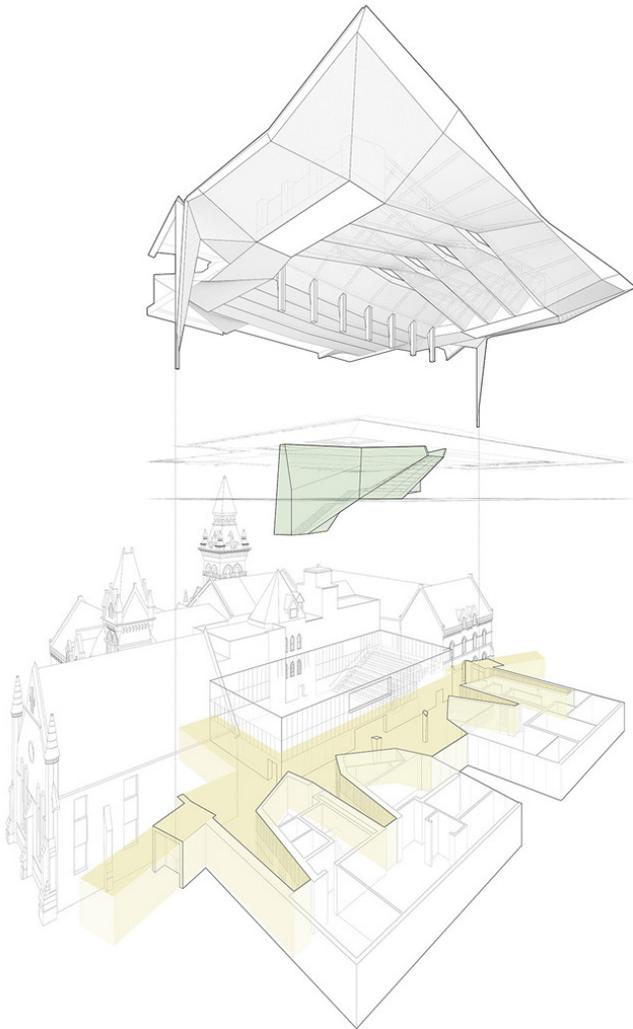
Plan drawings of the Daniels Faculty Architecture Building
